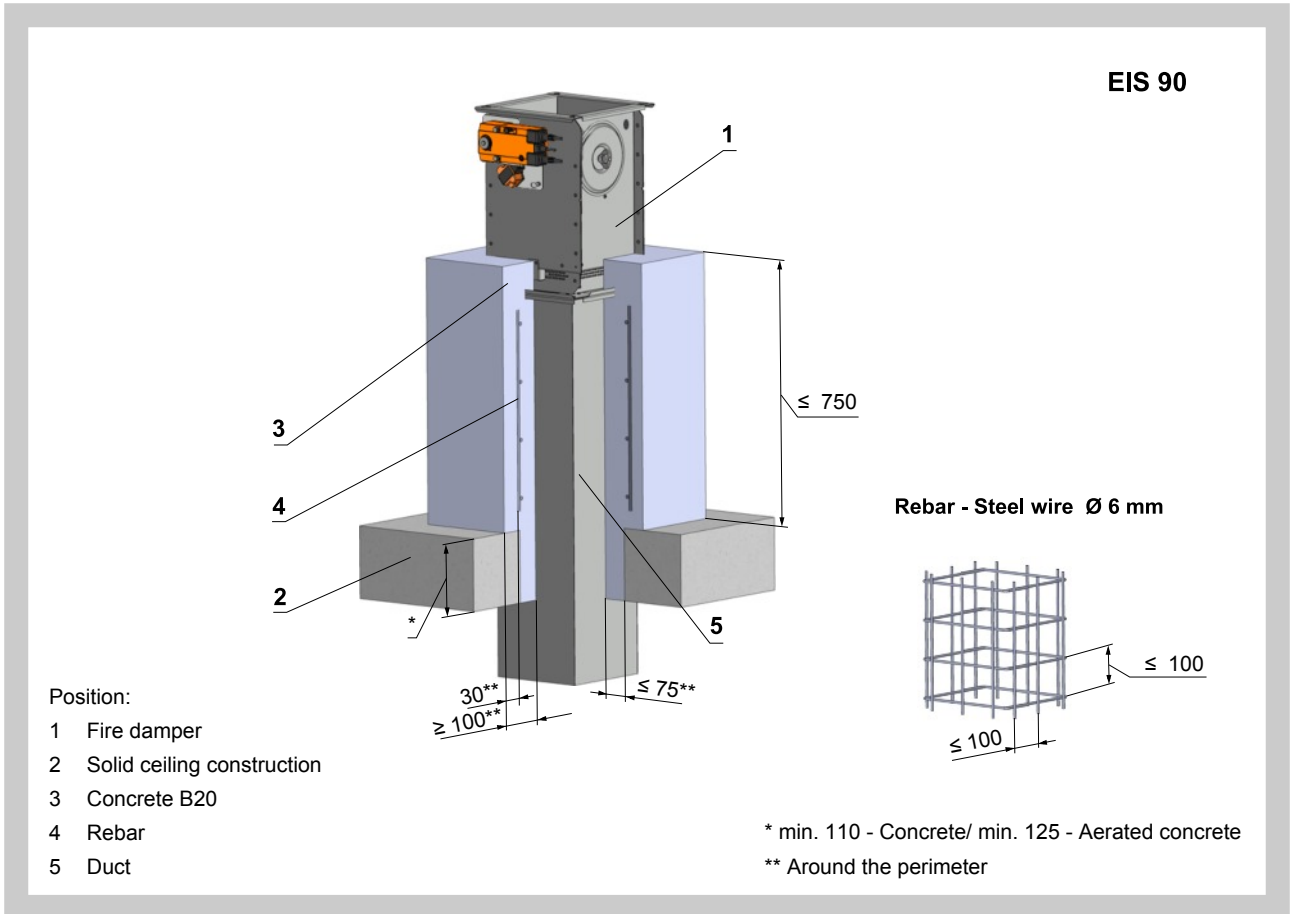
Outside solid ceiling construction - concrete - installation frame E4
